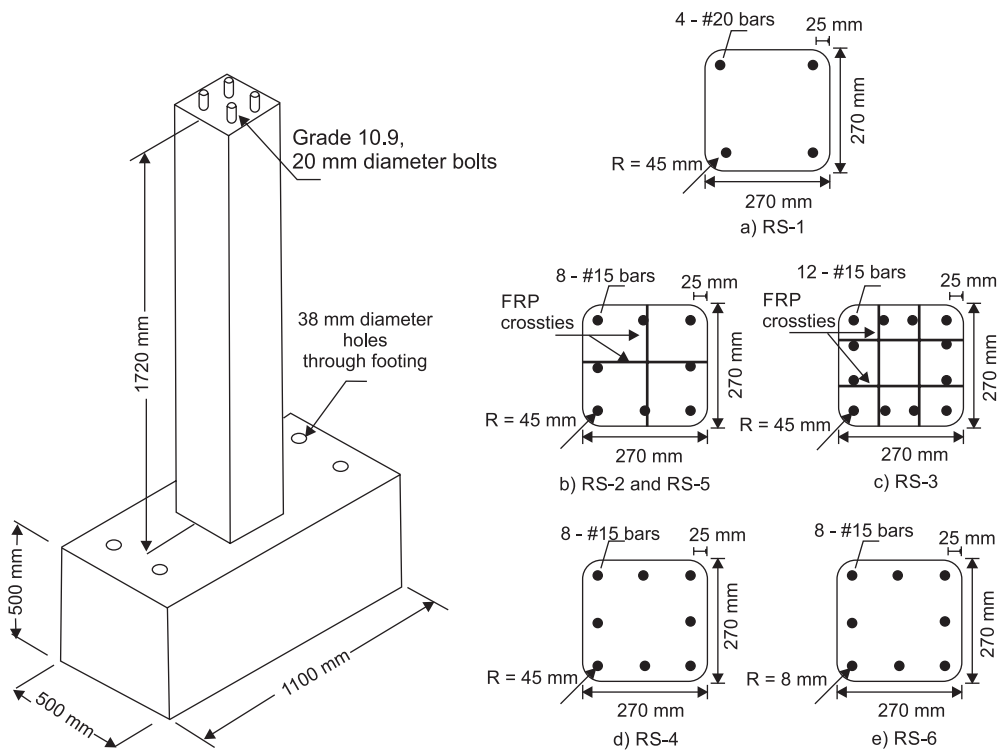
Typical column reinforcement and FRP SIP form details
